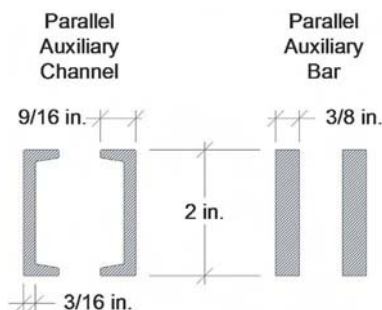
Cross-section views: Parallel auxiliary channels and bars. The parallel components act as beams to support cable racks, busbars, and other apparatus, which may be suspended above or below. They also may support equipment frames from the top.
